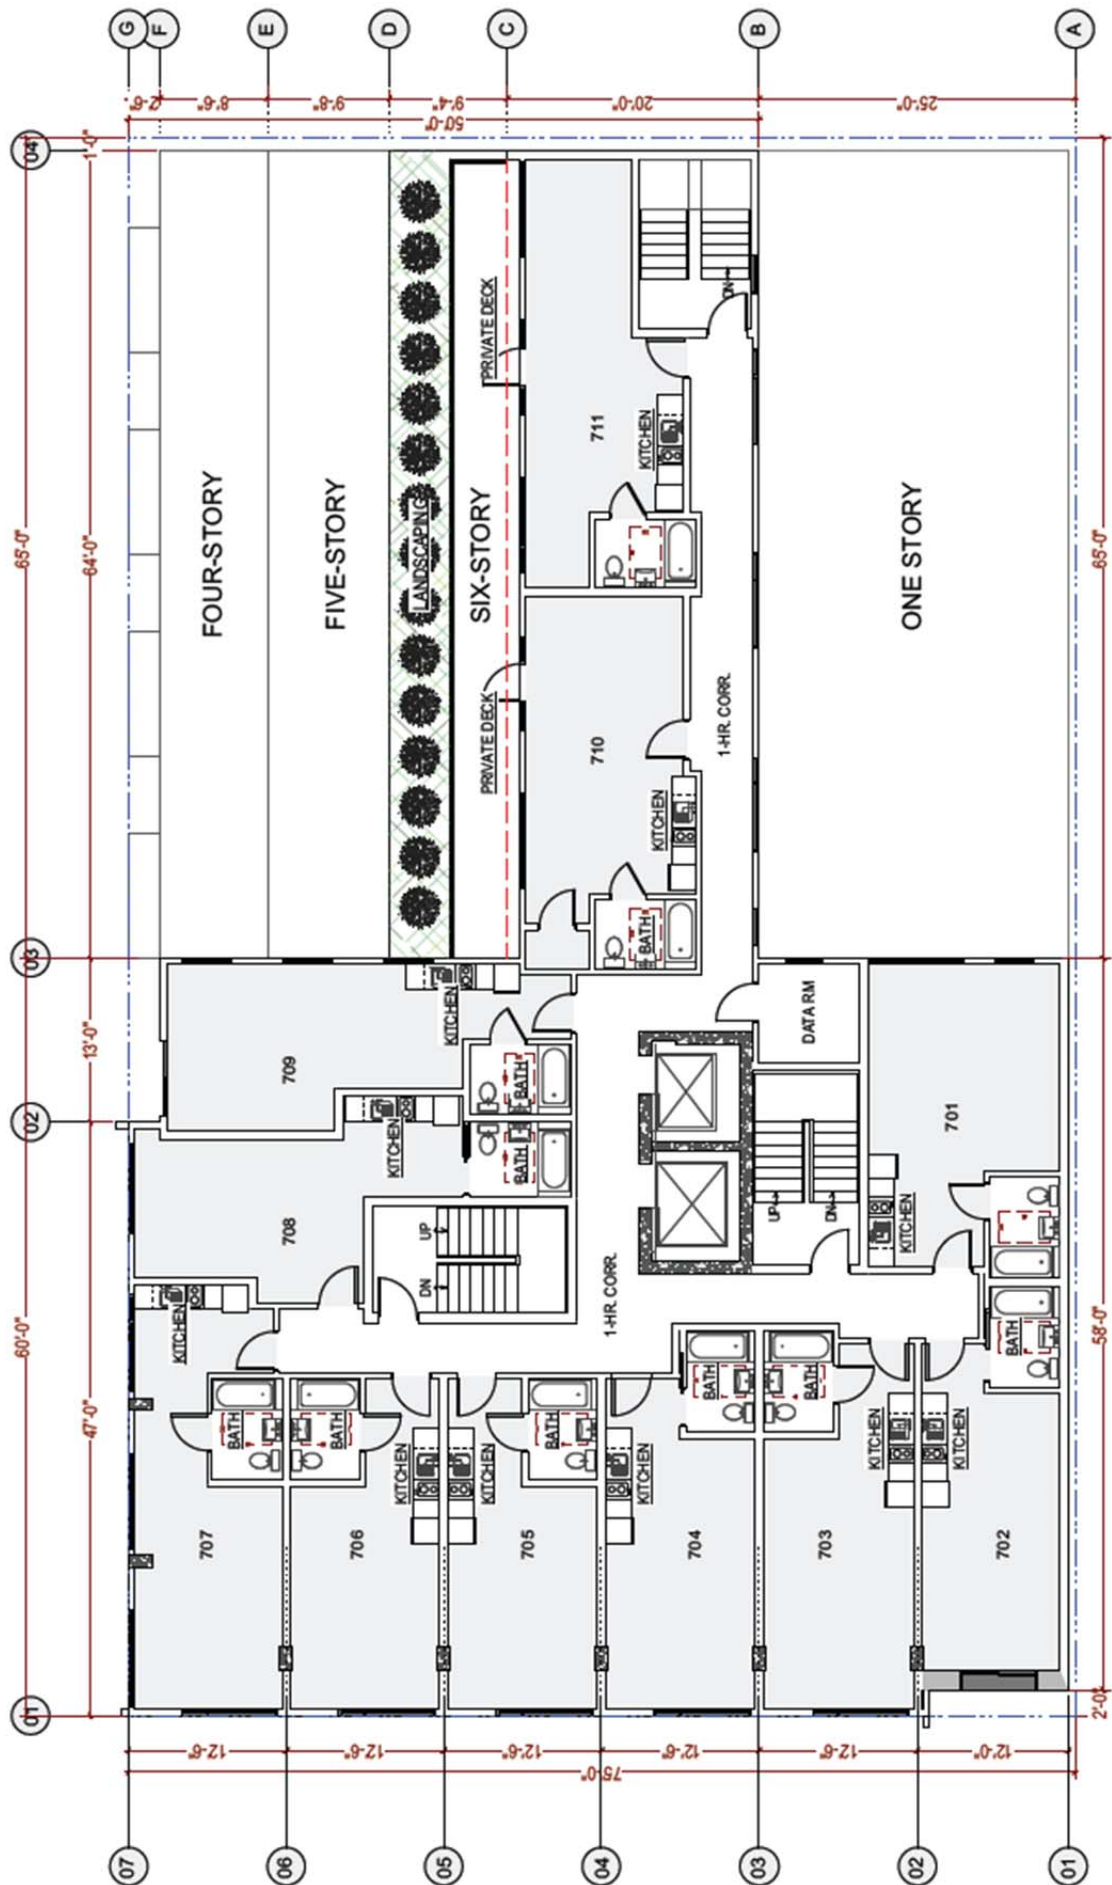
PROPOSED SEVENTH FLOOR PLAN
